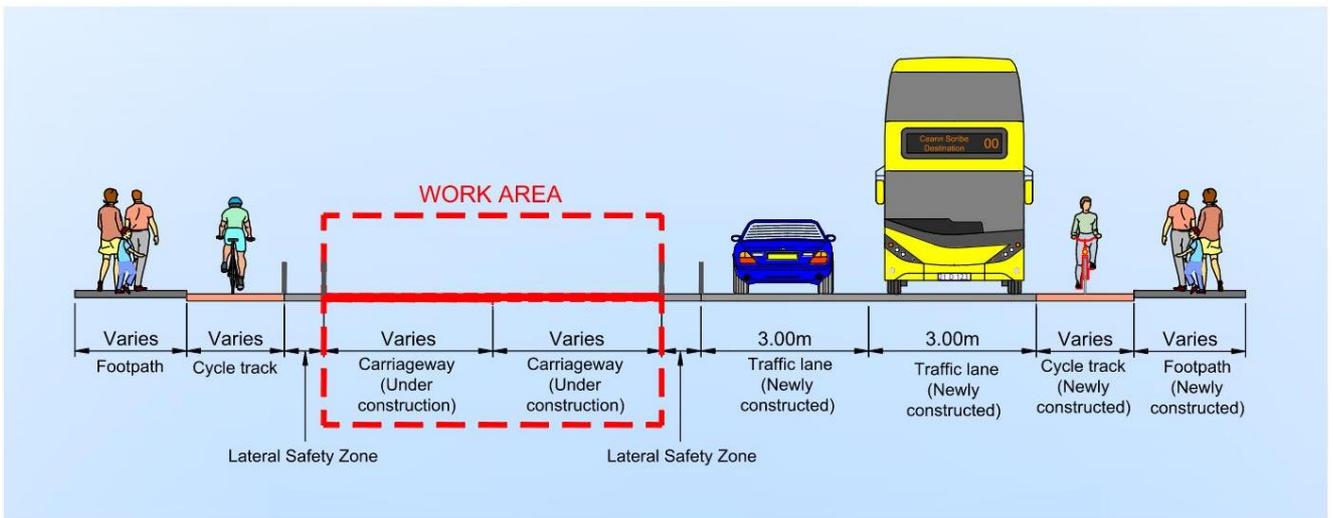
Traffic Management Cross Section, Section 7b – Stage 2
